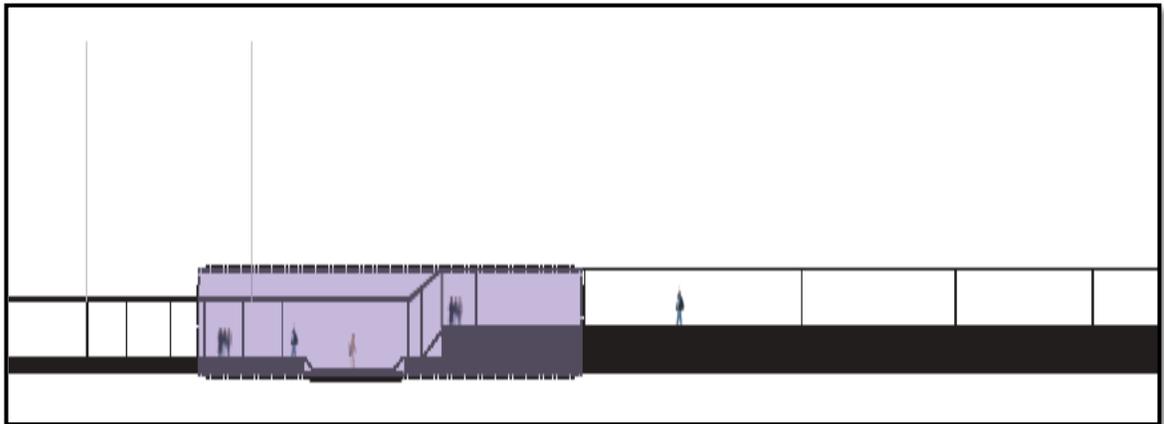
Sectional Diagram of Bloor Street Underground Pathway
